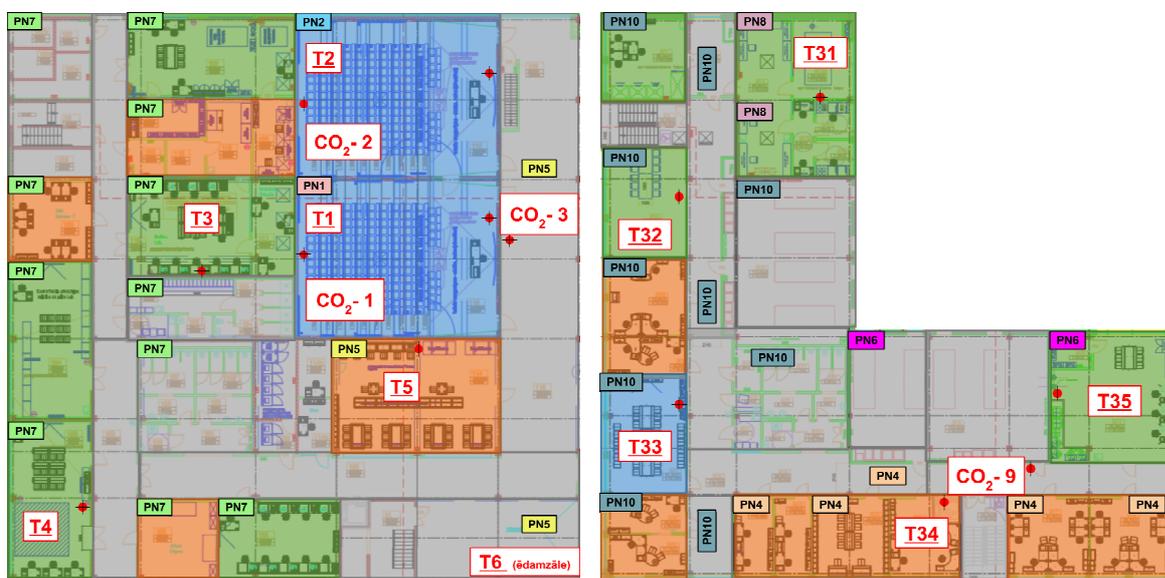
Faculty building PN zones and sensor placement: first floor (left); sixth floor (right)
